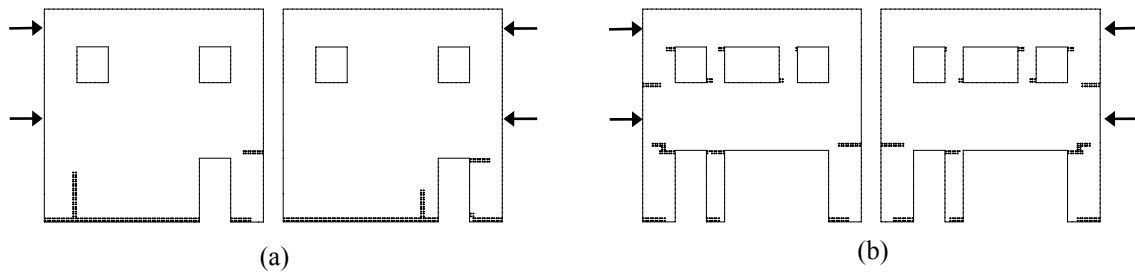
Crack pattern for fine mesh membrane analysis for loading in each direction: (a) wall 1, (b) wall 2.
